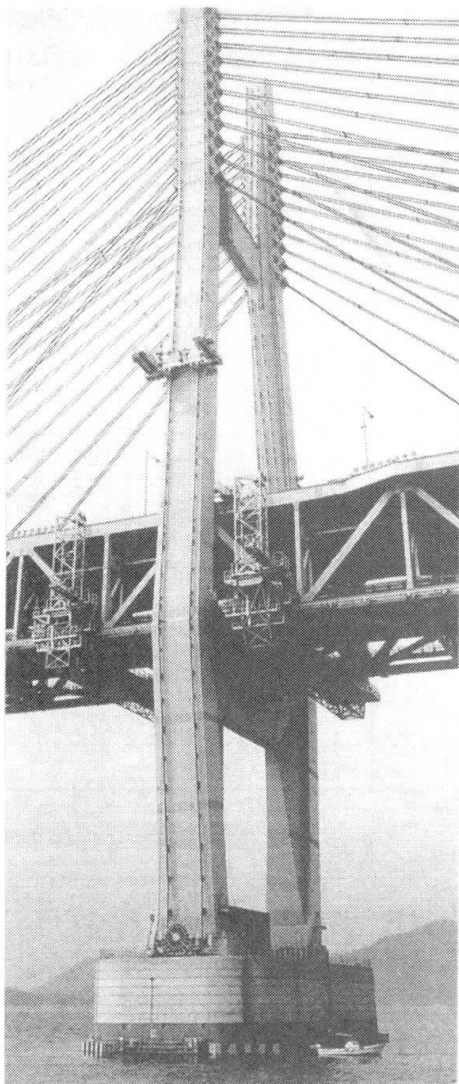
Work vehicle for inspecting girder and tower exteriors
